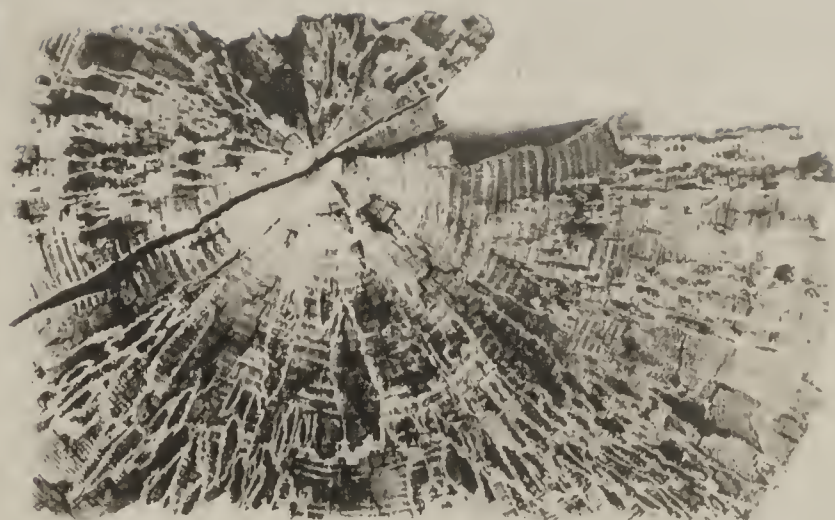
Ends of planks in a textile mill roof rotted over the supporting beam. The rot has also extended three or four inches into the beam. (After Hoxie.)
